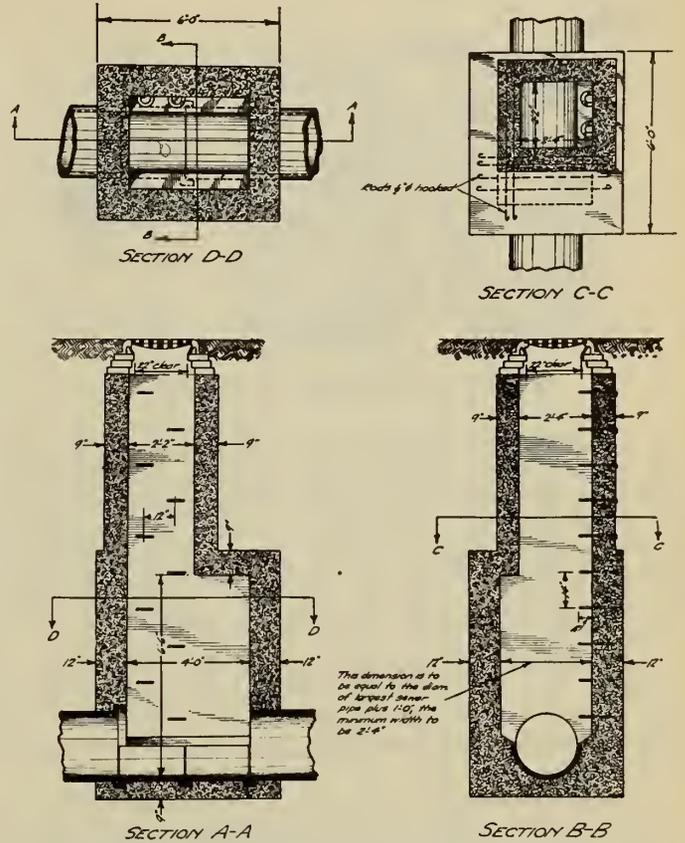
Standard Concrete Manhole without Drop for Lateral Sewers.
